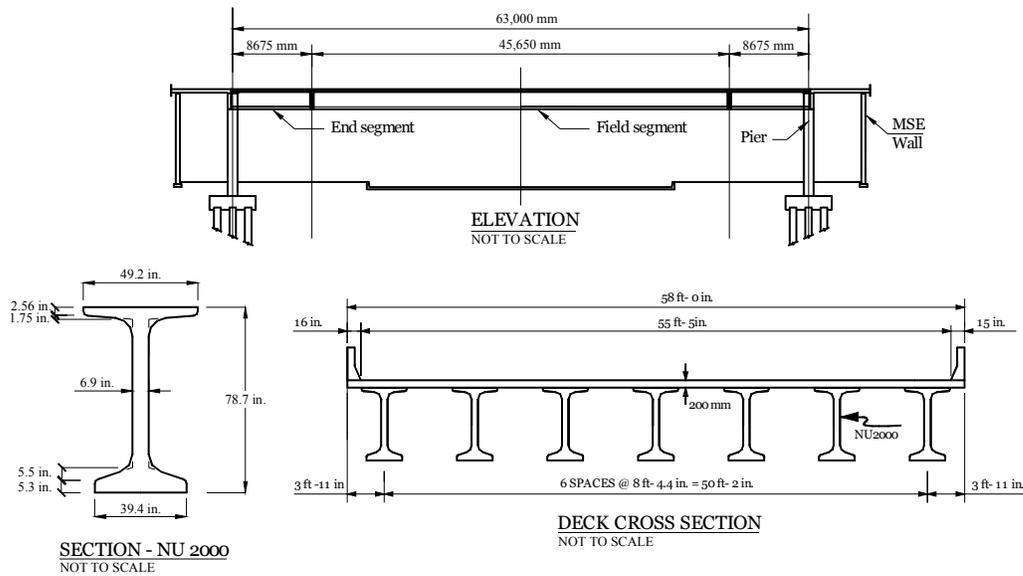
General Layout of the 198th – Skyline Drive Bridge
